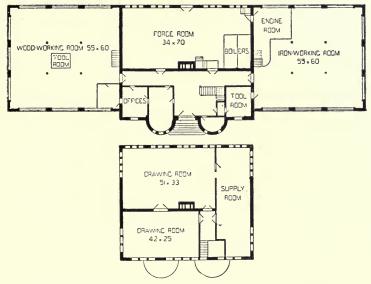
Plan of Rindge Manual Training School, Cambridge, Mass.
